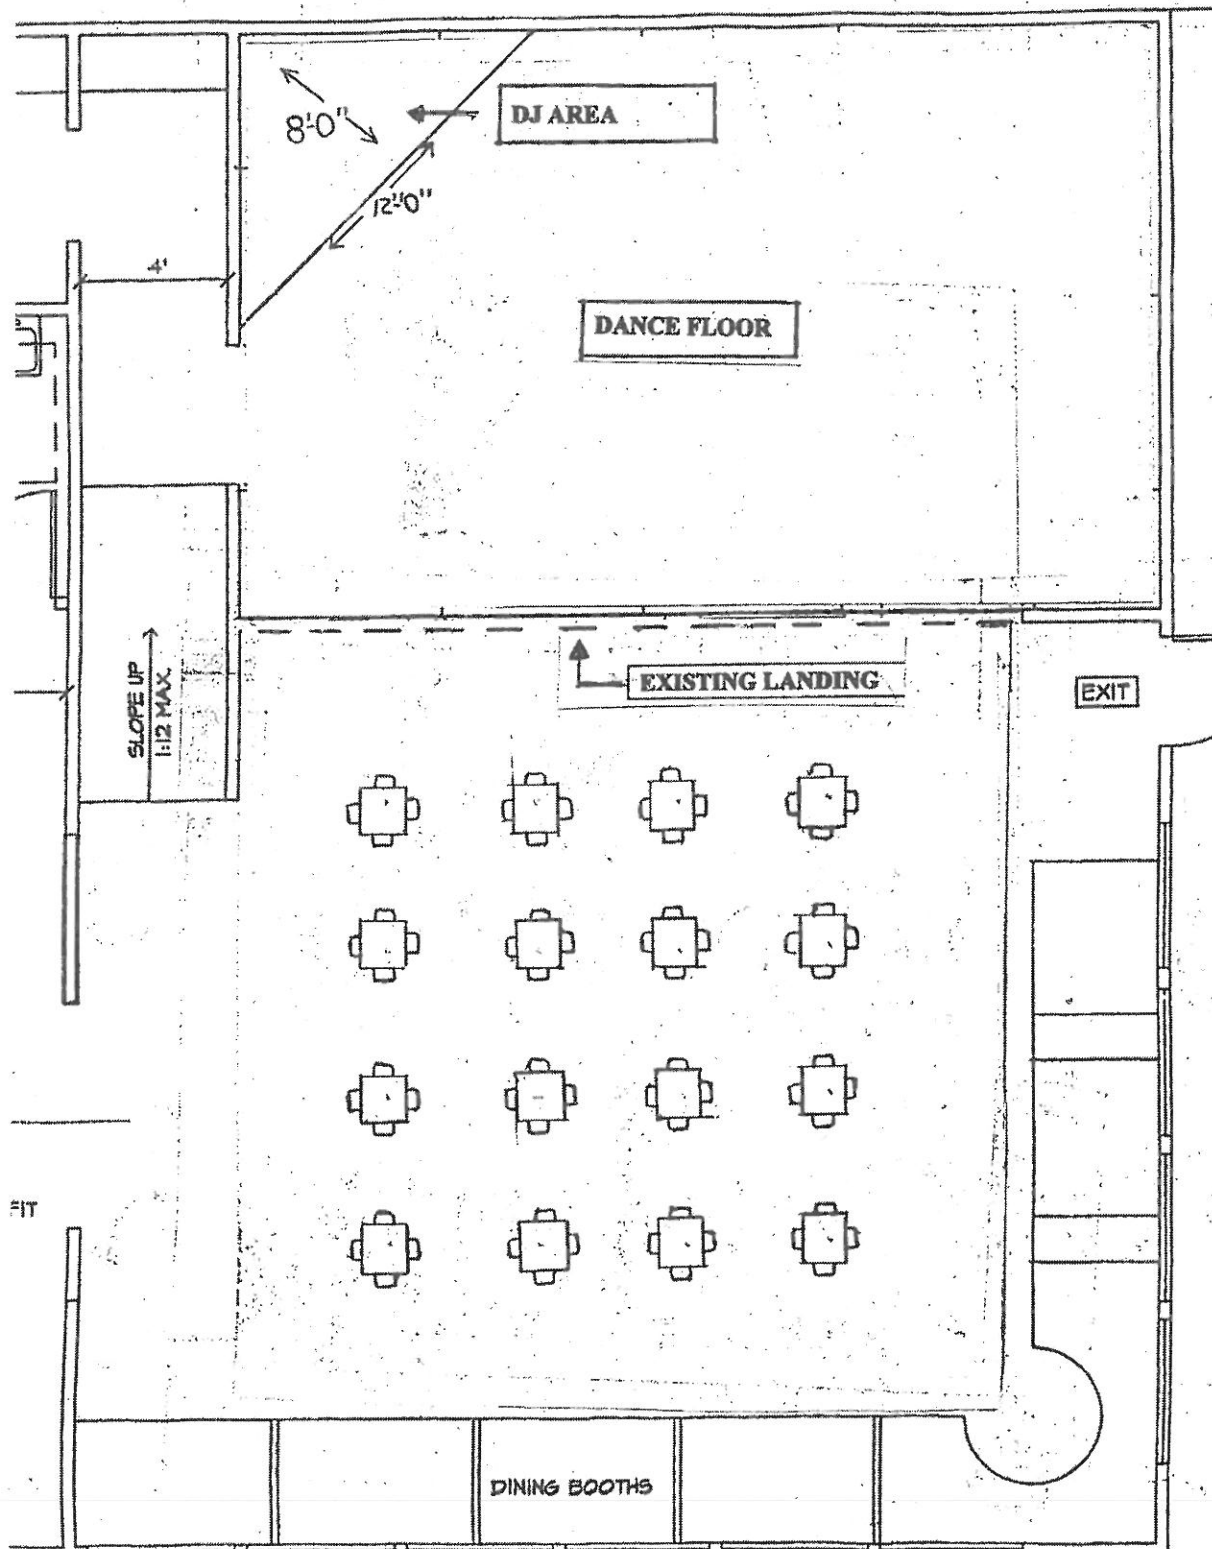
EXHIBIT "E"—ENLARGED FLOOR PLAN (PROPOSED)
